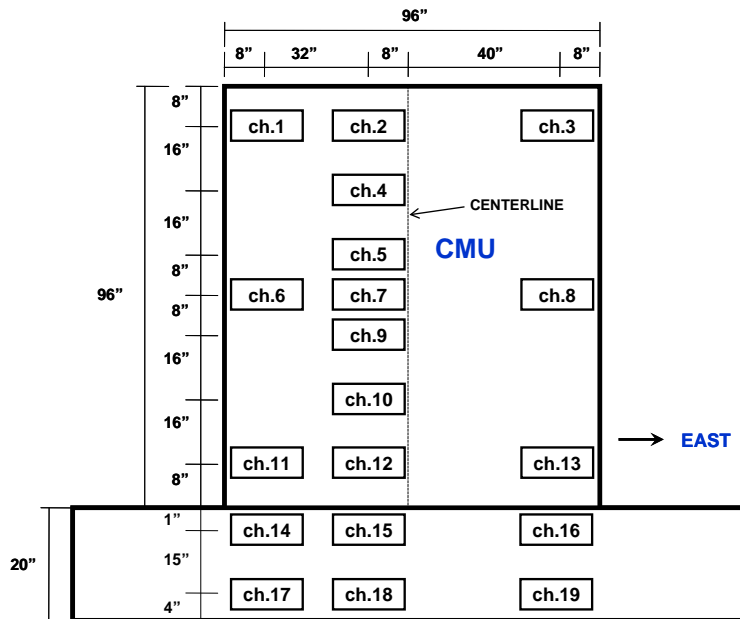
Instrumentation of quasi-static, out-of-plane CMU wall specimens (CMU side)
